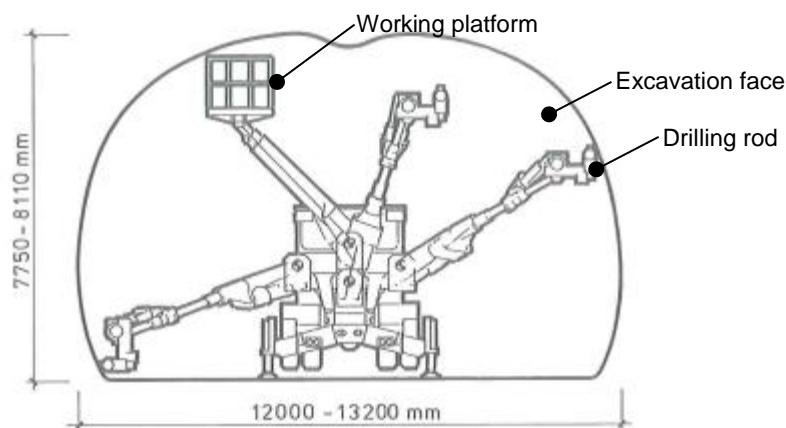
Operating area of the drilling jumbo with three drilling rods and a working platform [L6]
